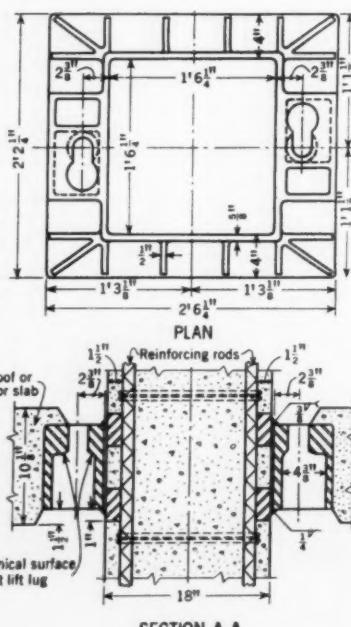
Lifting collars carry slab up precast reinforced concrete columns. Note size and locations of welds.
